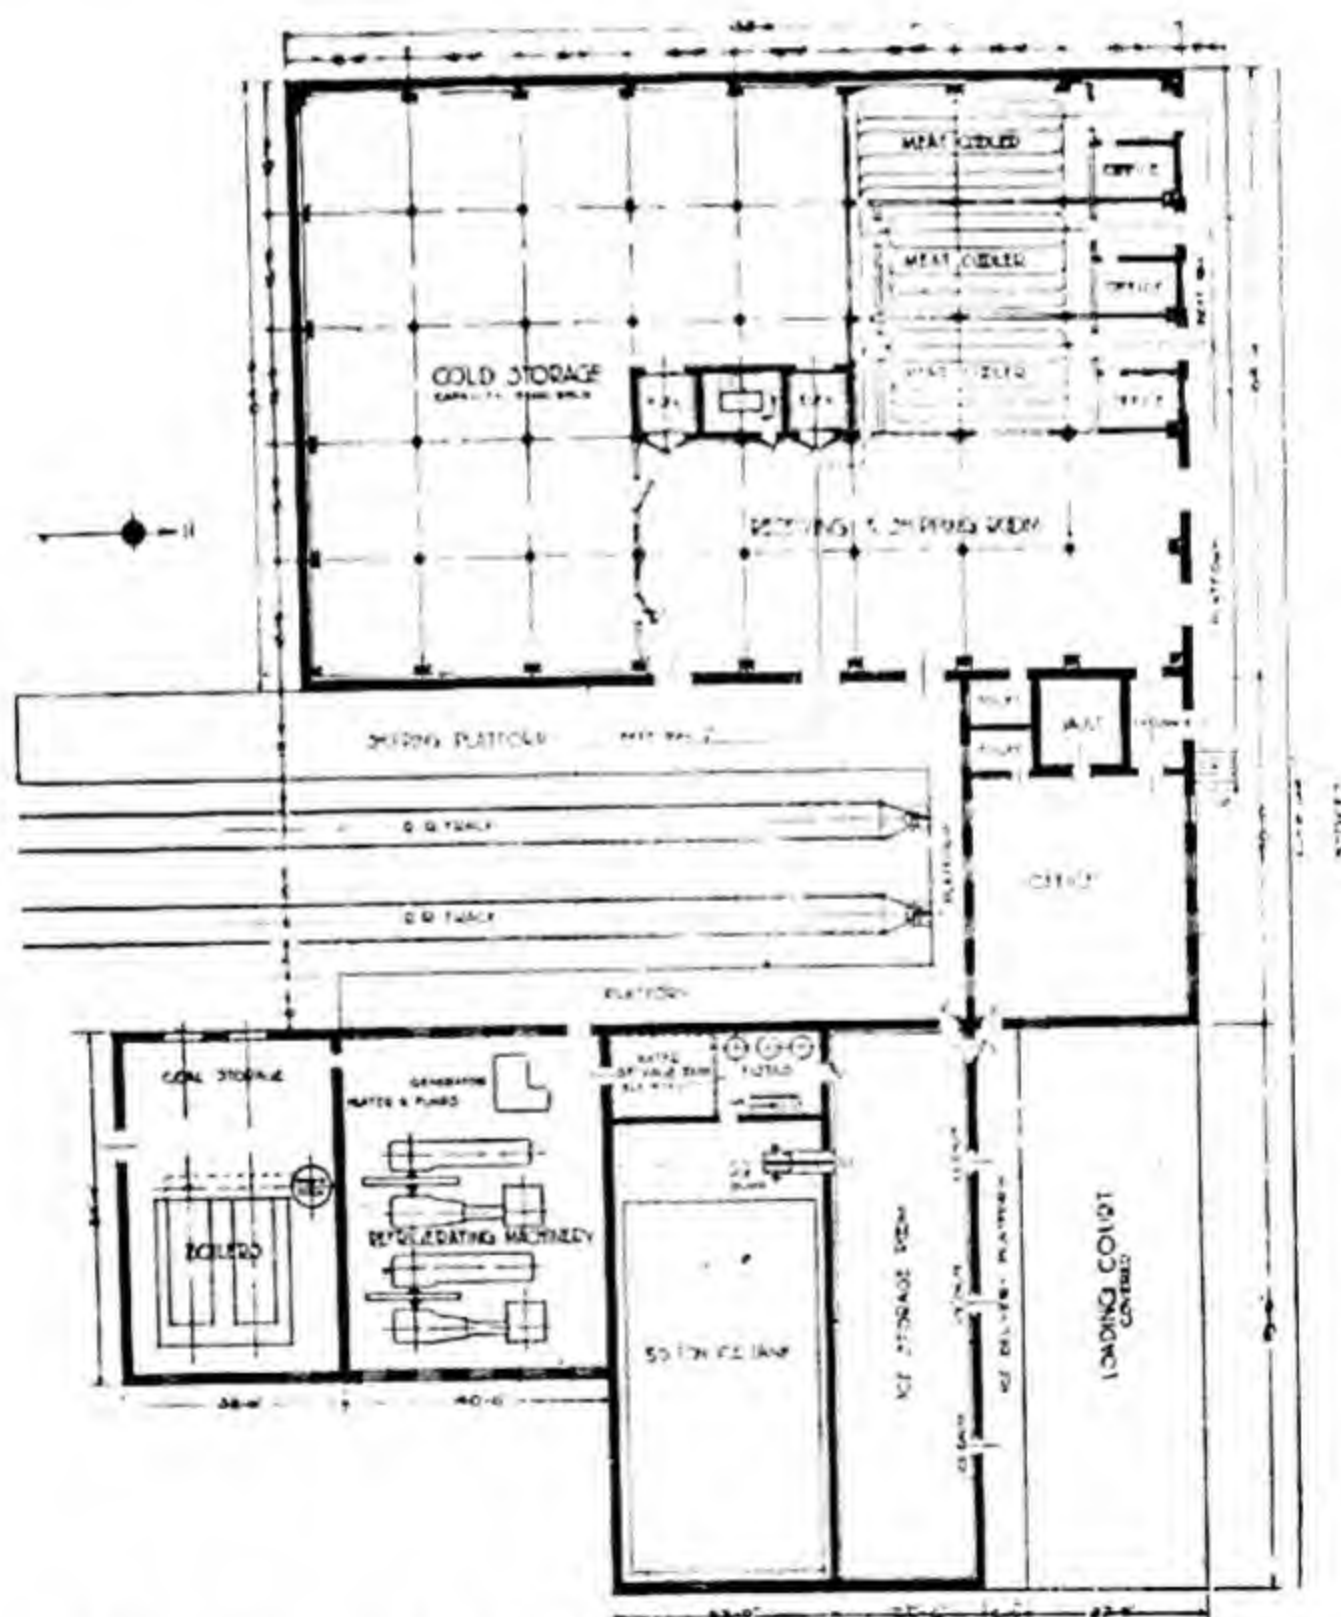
Plan of First Story of Small Cold Storage and Ice Making Plant.
